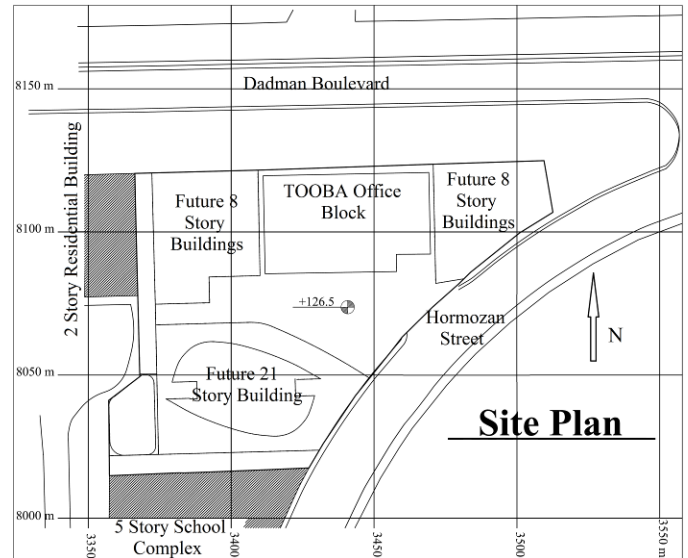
Plan view of the location of the site, the adjacent and future buildings, and the neighboring streets
